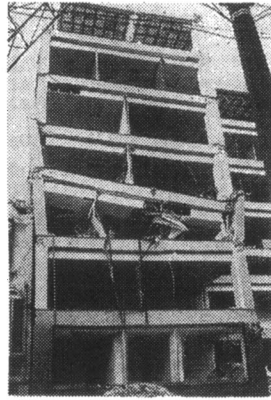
Single span seven-story building showing the heavy damage at the joints of the third floor due to the 1985 Mexico earthquake
